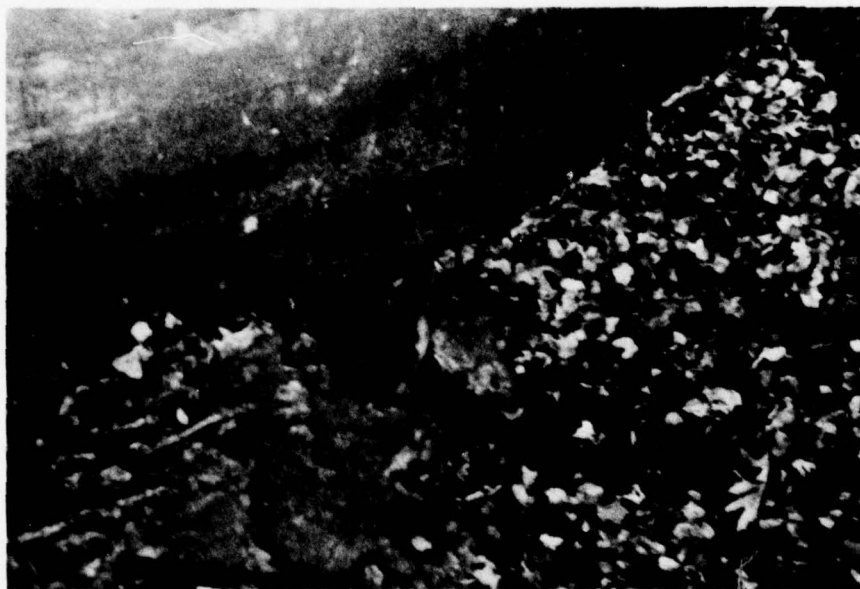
View of eroded pocket between spillway toe and apron, adjacent to right wing wall
